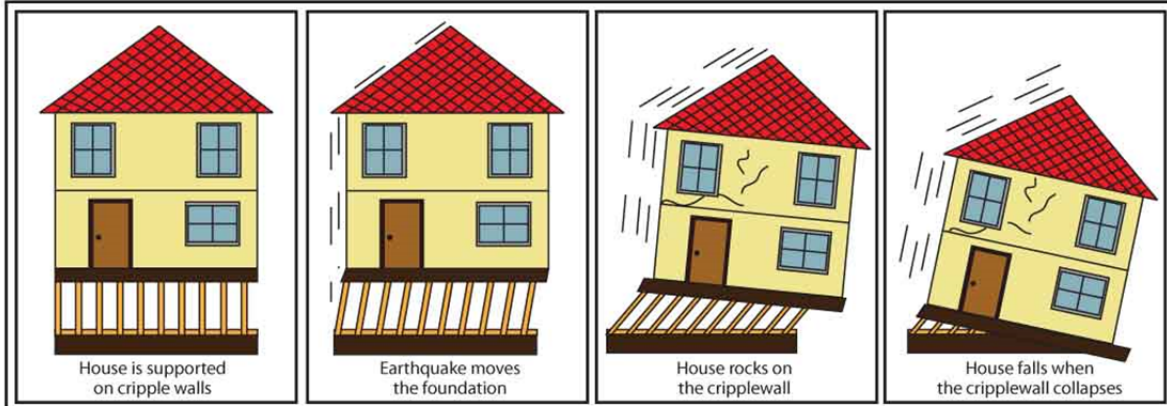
Schematic representation of wood building failure as a result of a cripple wall collapse (Courtesy of Weinstein Construction Corporation).
